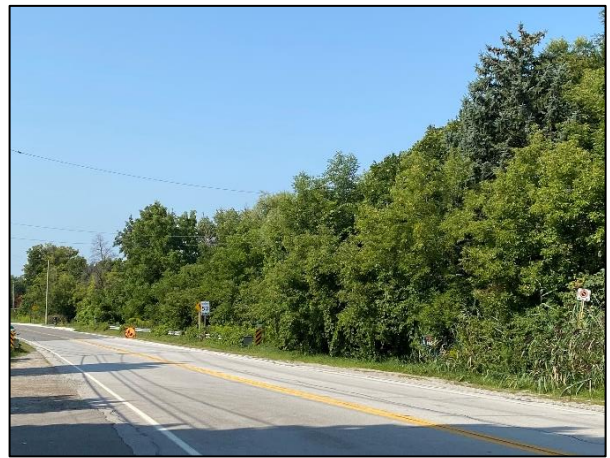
View of the subject property facing southwest towards 5 Side Road (Town of Halton Hills 2024)
